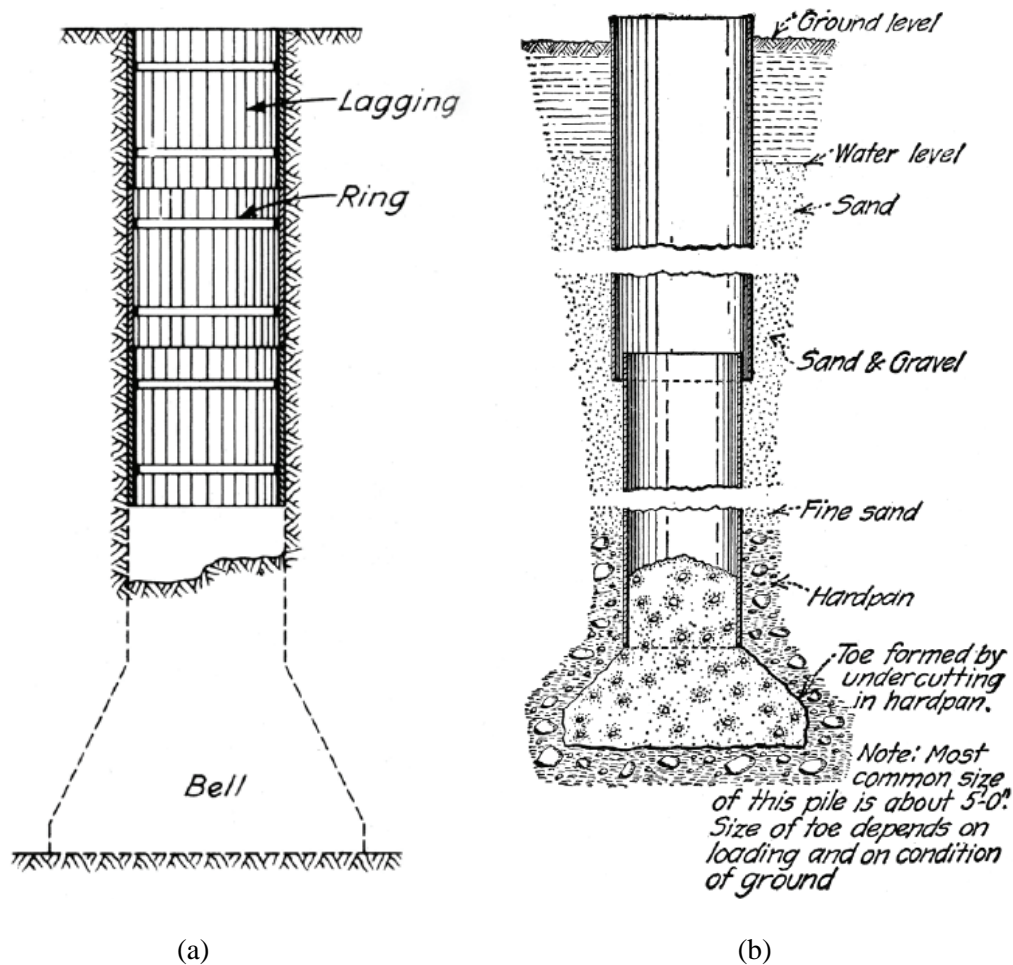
Early “Caisson” Foundations (Rogers, 2006); (a) “Chicago Method” and (b) “Gow Caisson”
